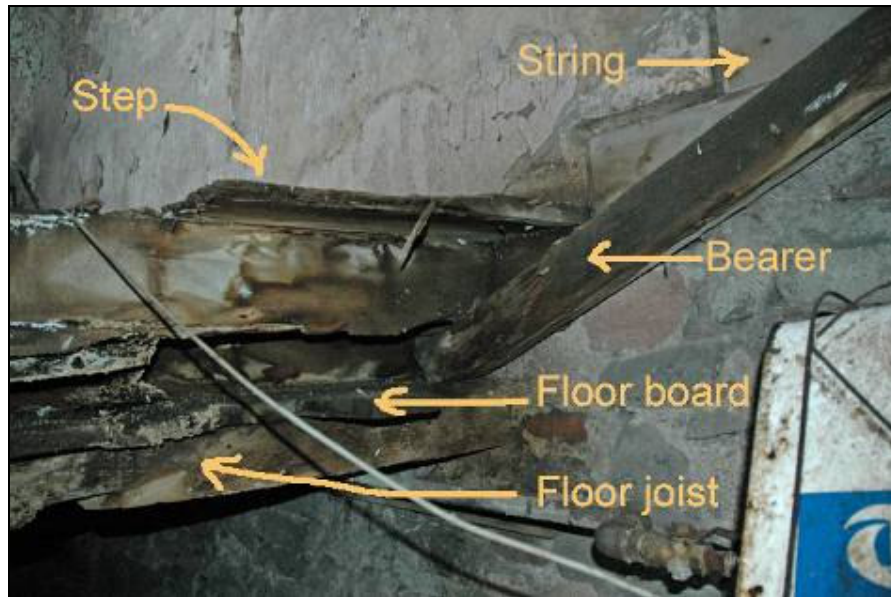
Remains of stairs to east wing, superimposed on top of original floor structure
